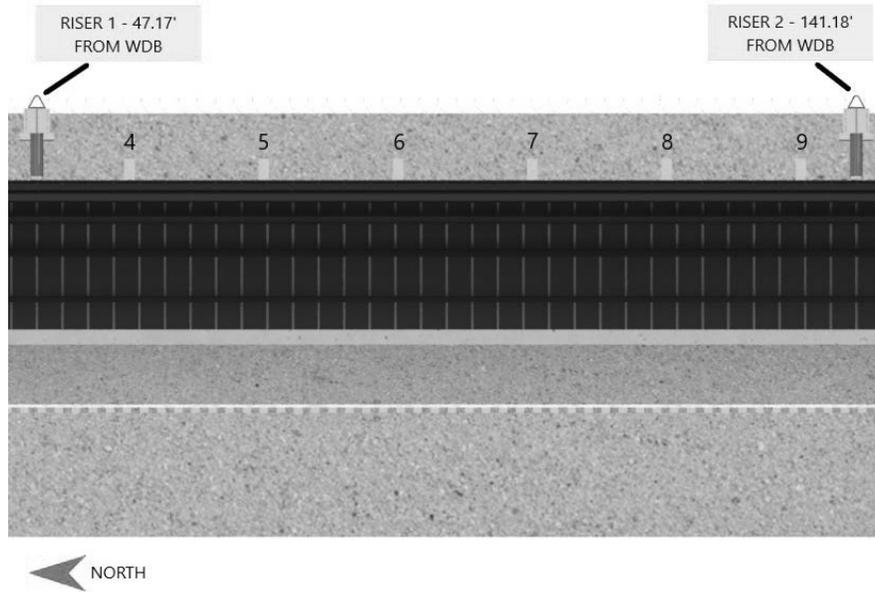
Riser 1 to Riser 2 Tunnel Section.
